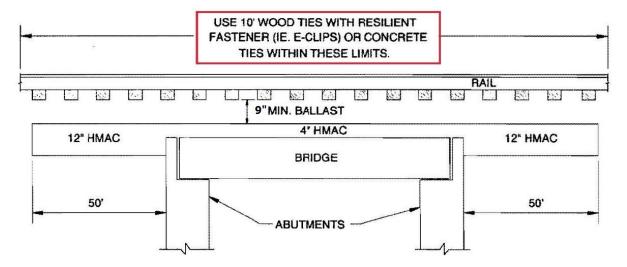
TRACK TRANSITION AT BRIDGE
